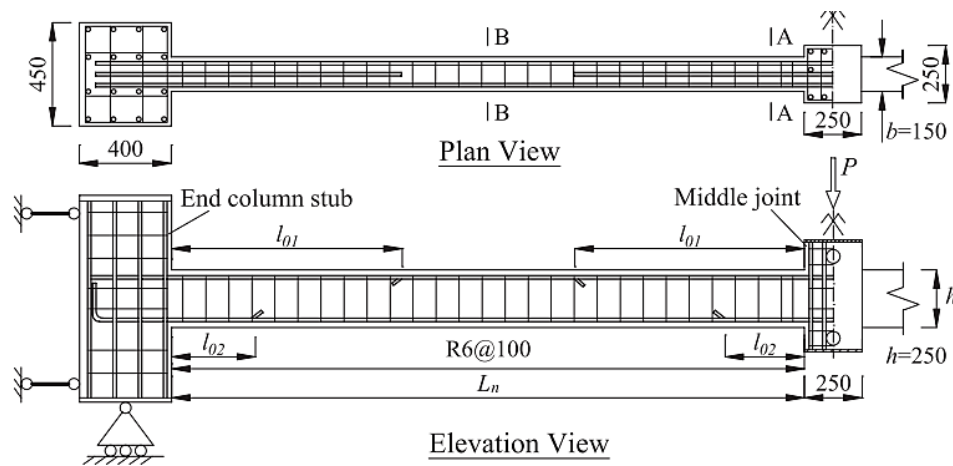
Detailing and boundary conditions of the specimens (unit: mm).
